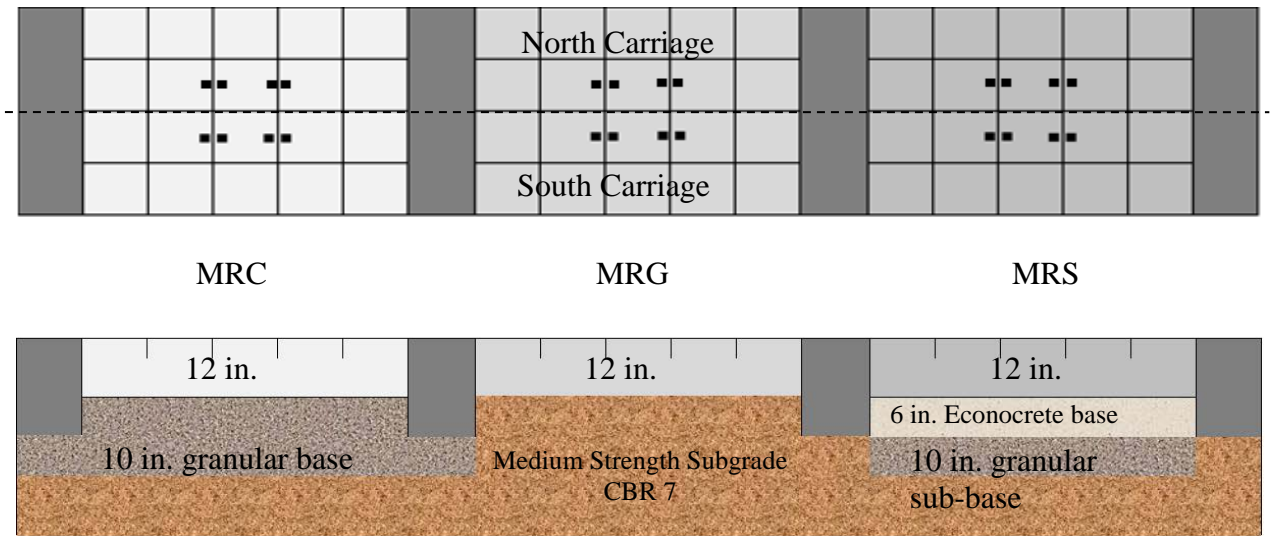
Plan and sectional view of CC2 test items (Wadkar, 2010)
